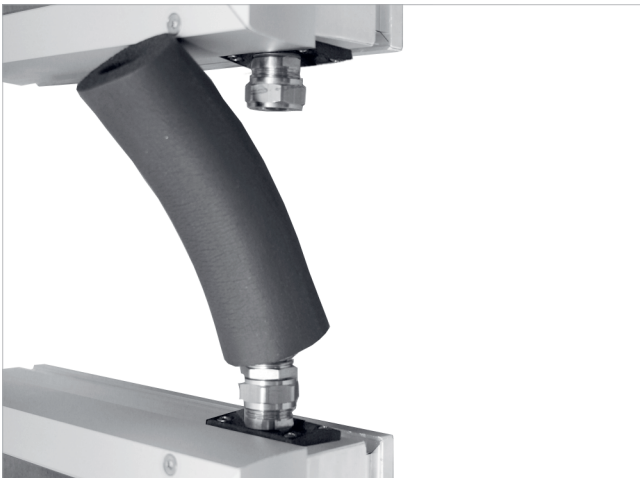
VB-F-S-D-UE screwed onto the lower connection
